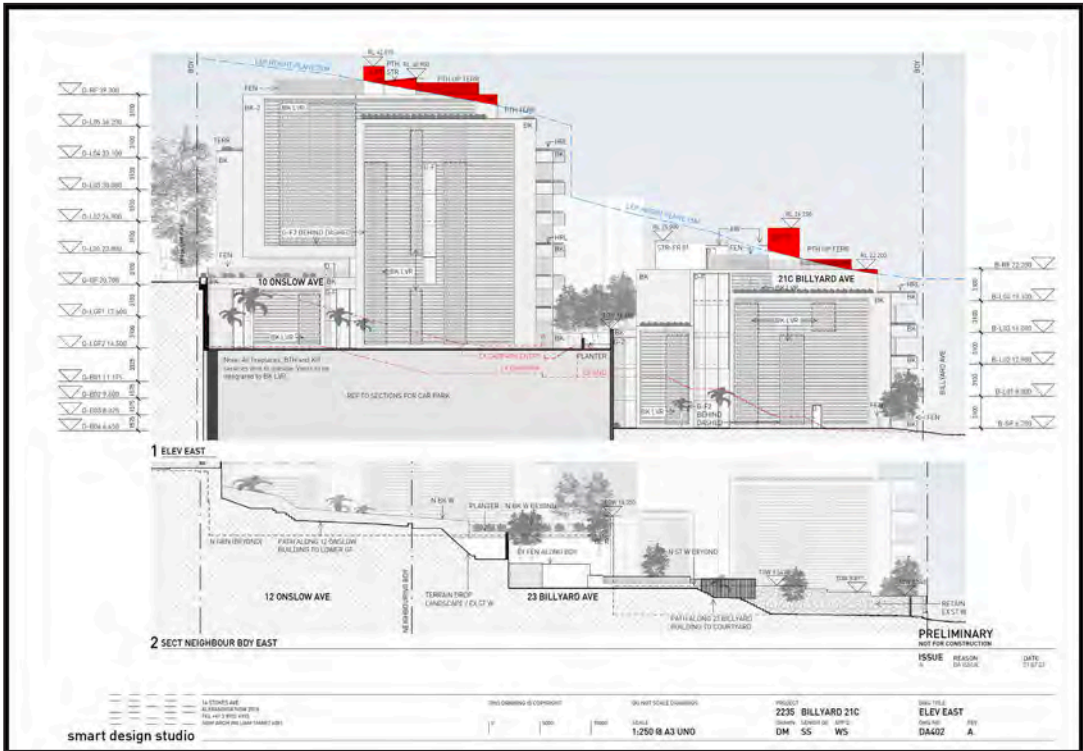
East elevation, indicating height exceedance in red overlay. Smart Design Studio.
